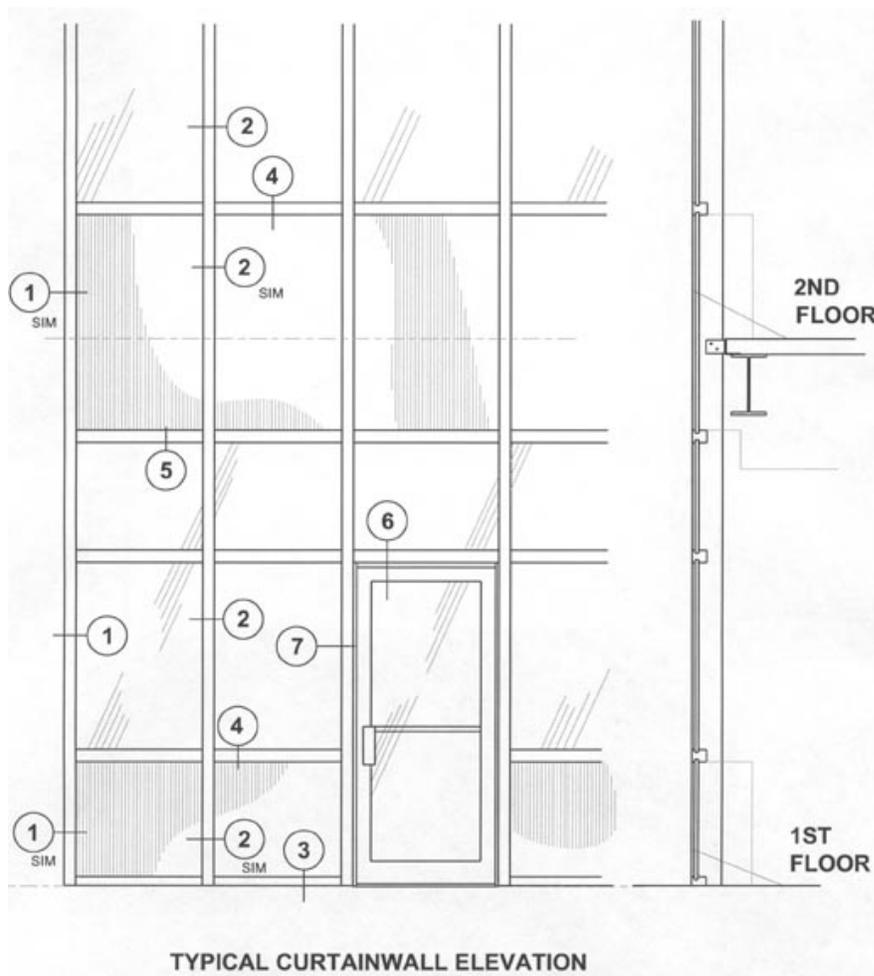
Typical curtain wall elevation (Extech [online]. (n.d.). from. [http:// www.extech-voegele.com/3000spec.htm2.jpg](http://www.extech-voegele.com/3000spec.htm2.jpg) [Accessed at December 2006.]
